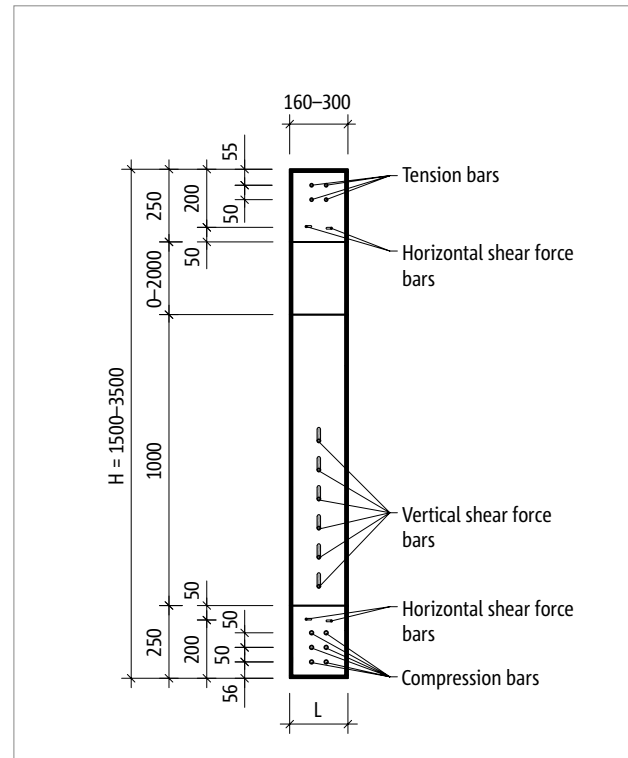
Schöck Isokorb® T type W-M4-R90: Product layout; perimeter fire protection boards
